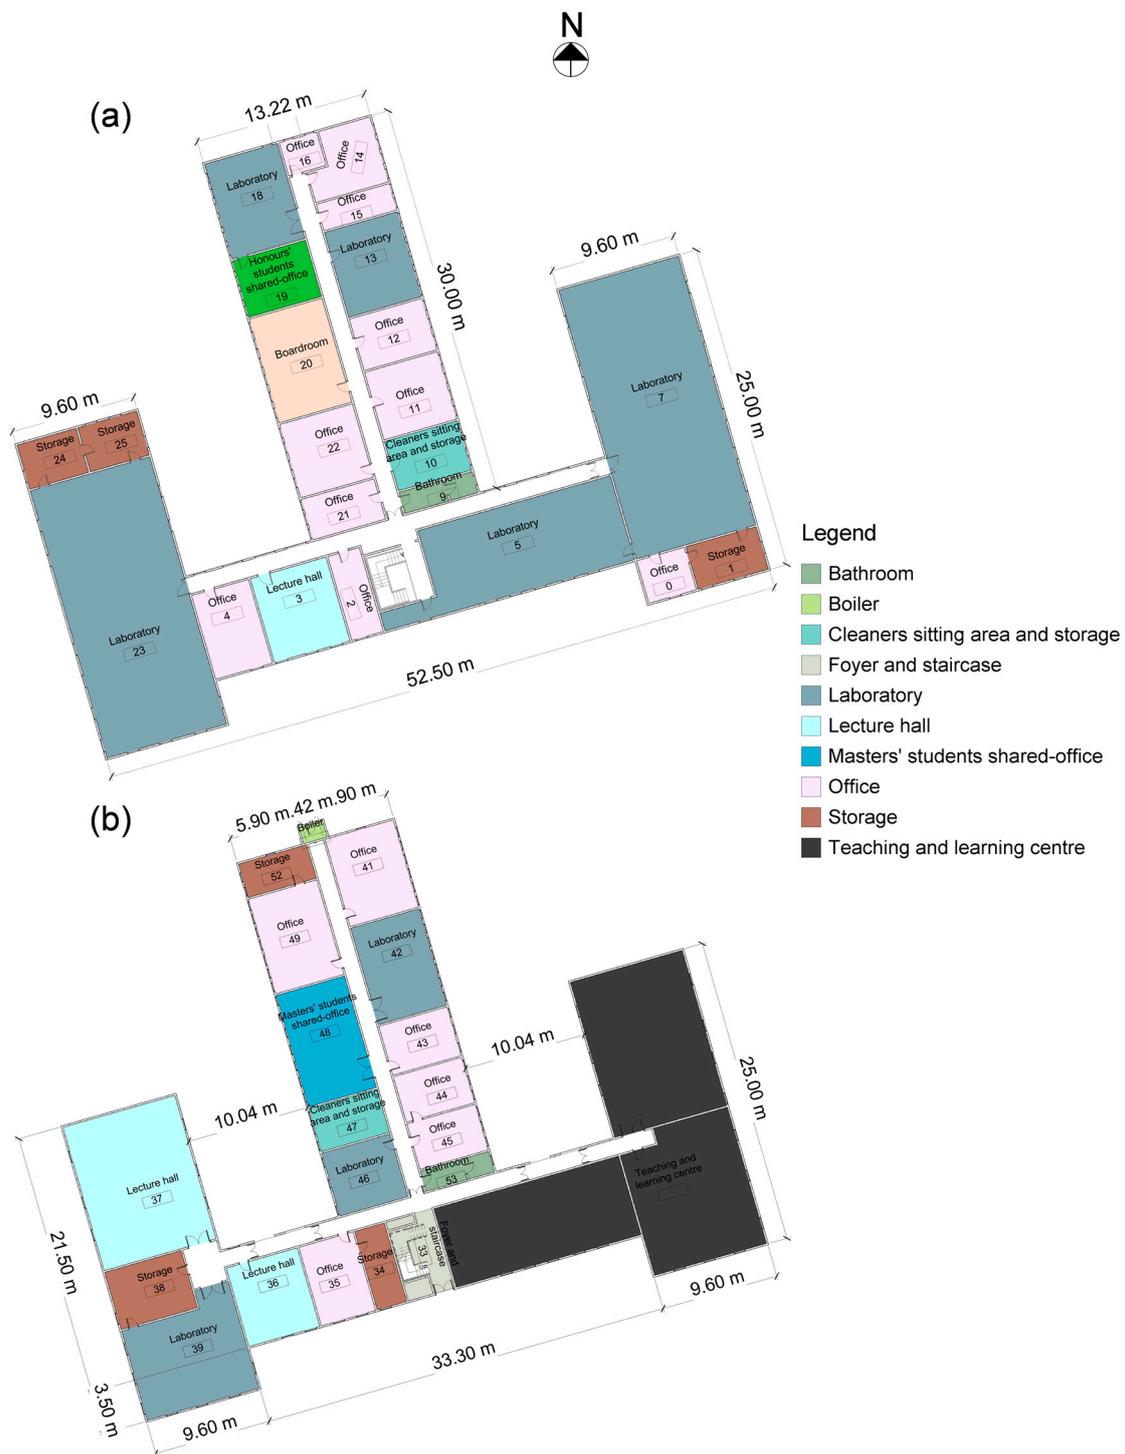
Floor plan of the case study building: (a) top floor and (b) ground floor.
